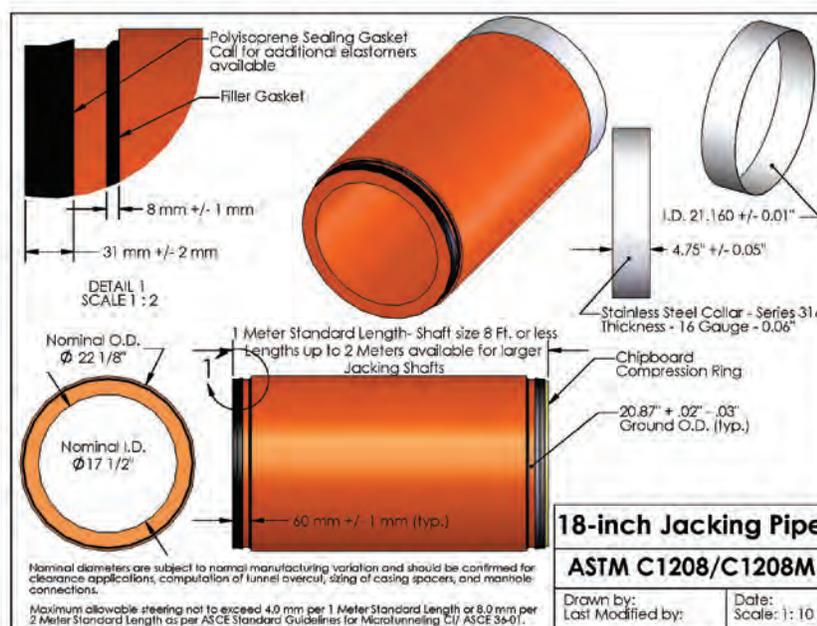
Example Jacking Pipe shop drawing for 18-inch pipe.
